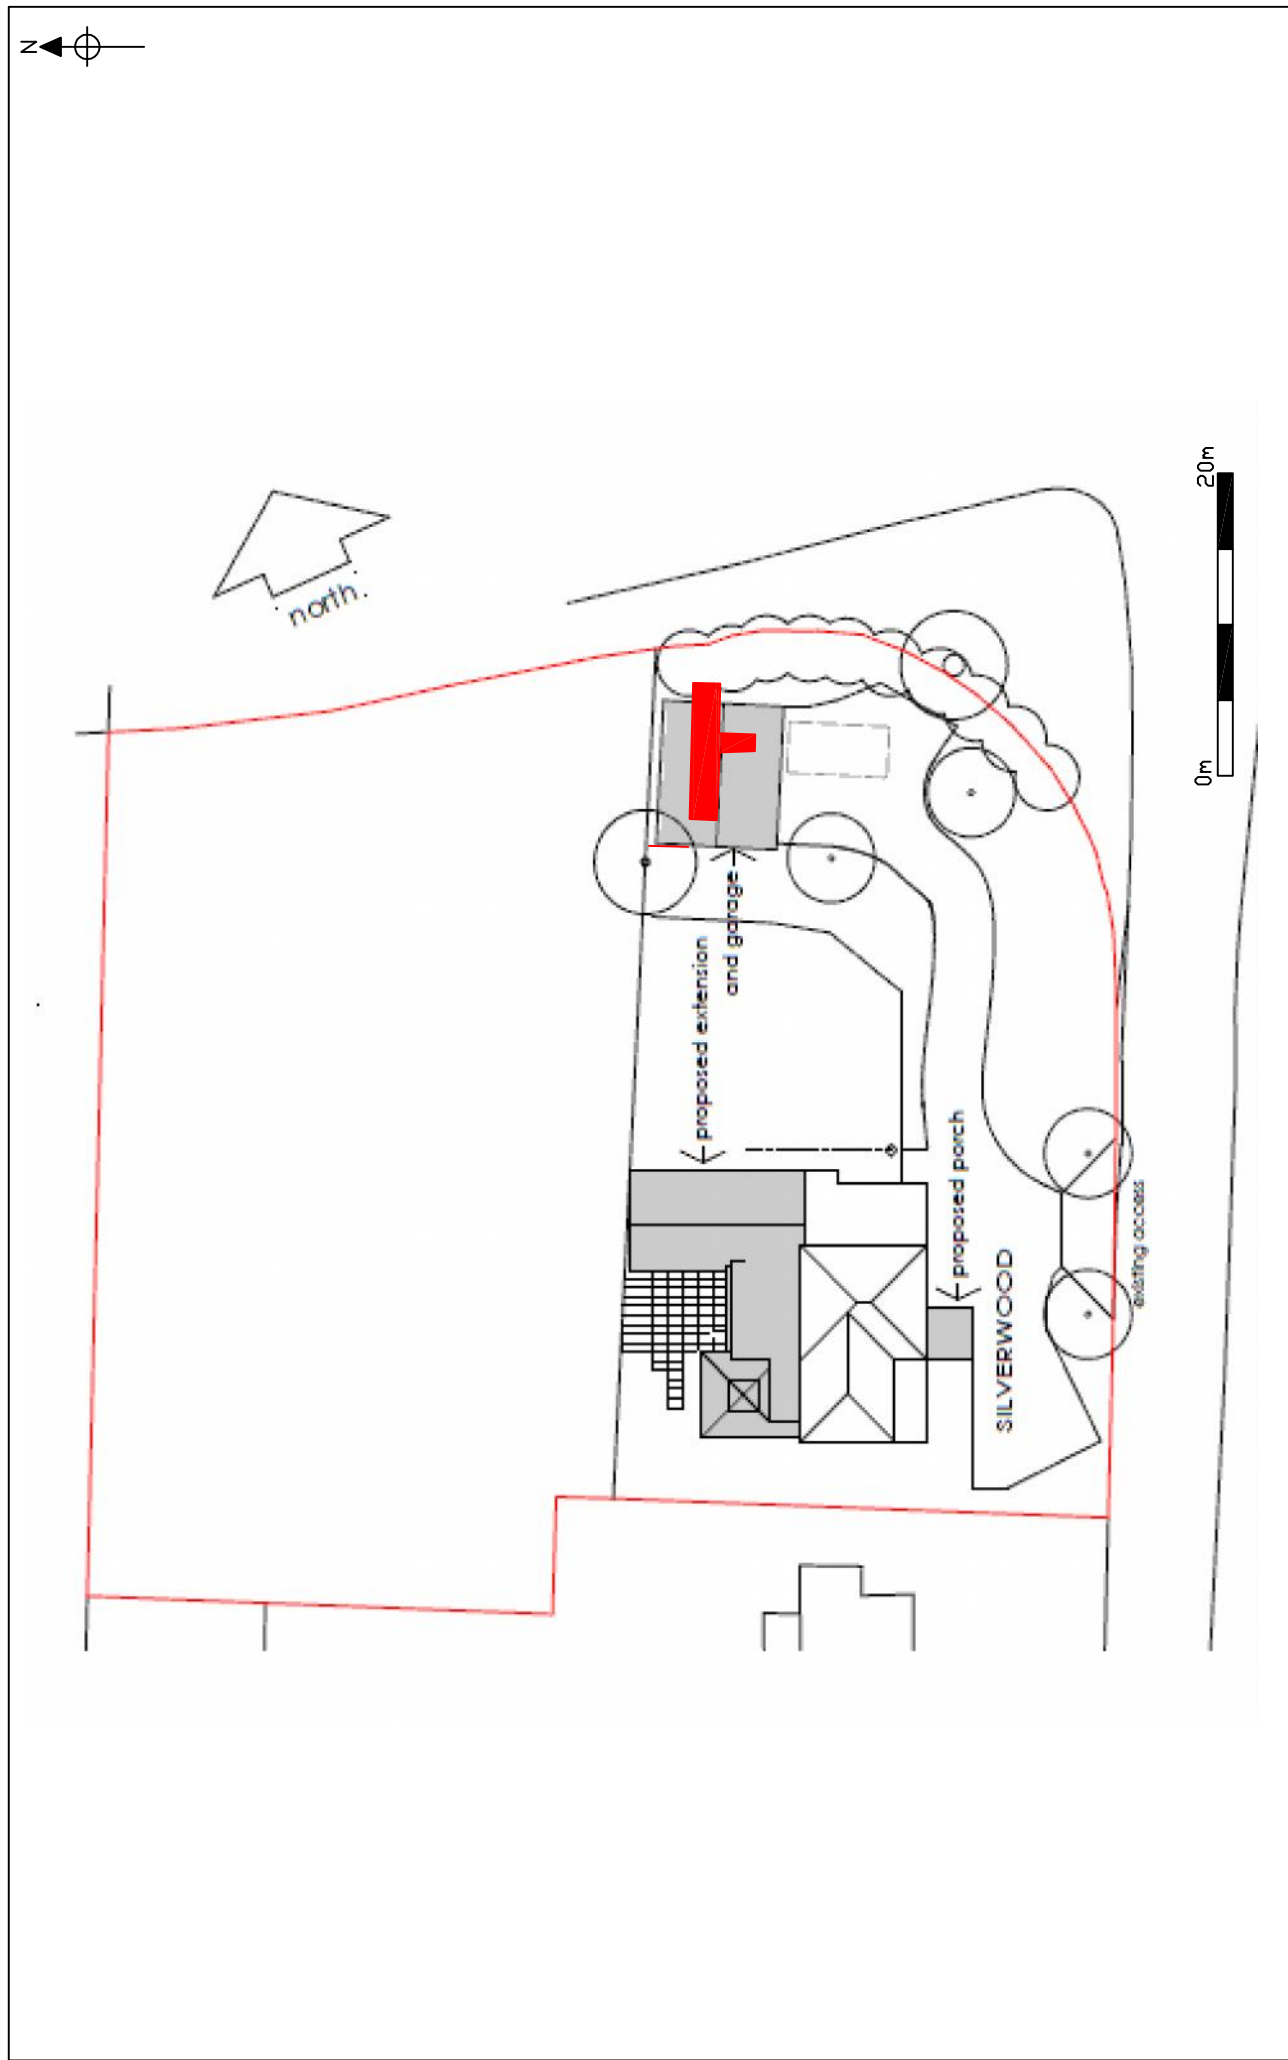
Plan showing proposed development and trench location. Scale 1:500.
